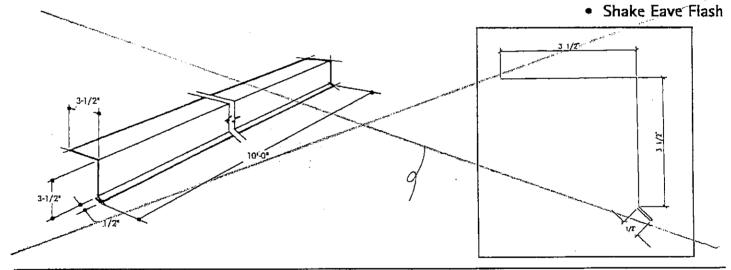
Overhang Roof Panels per Manufacturer Recomendations
